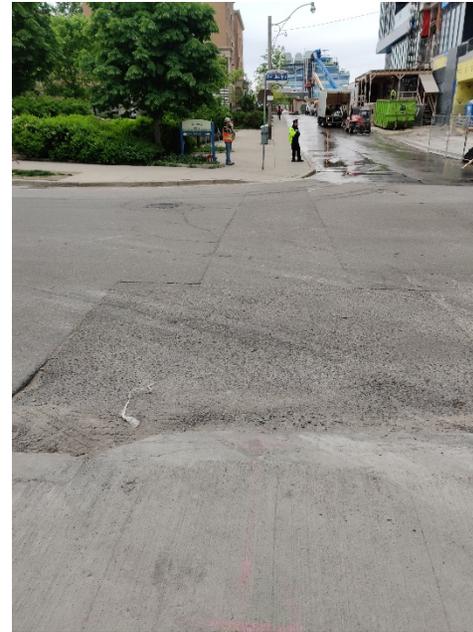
E Liberty St/Western Battery Rd intersection (looking north)
